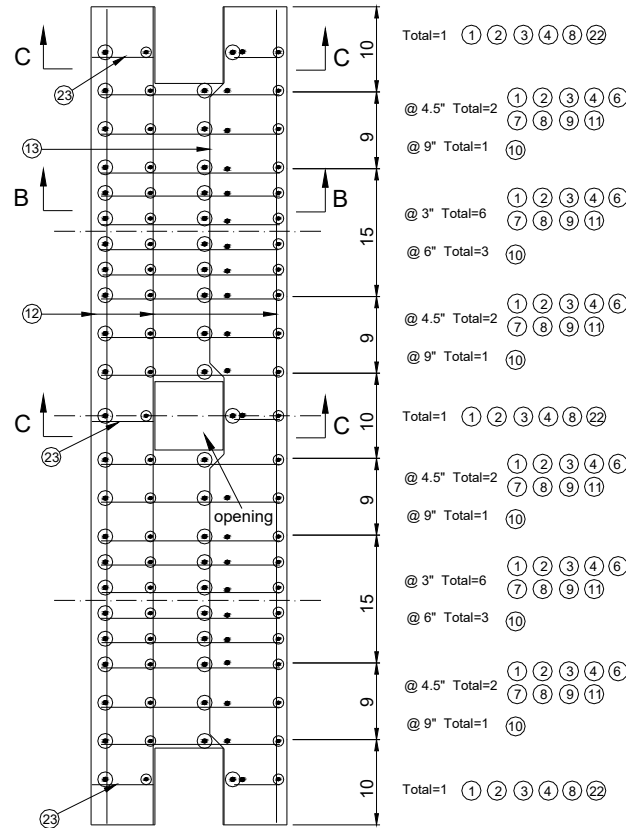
Reinforcement details of specimen S1 (Dimensions [in.]: 1"=25.4 mm).
